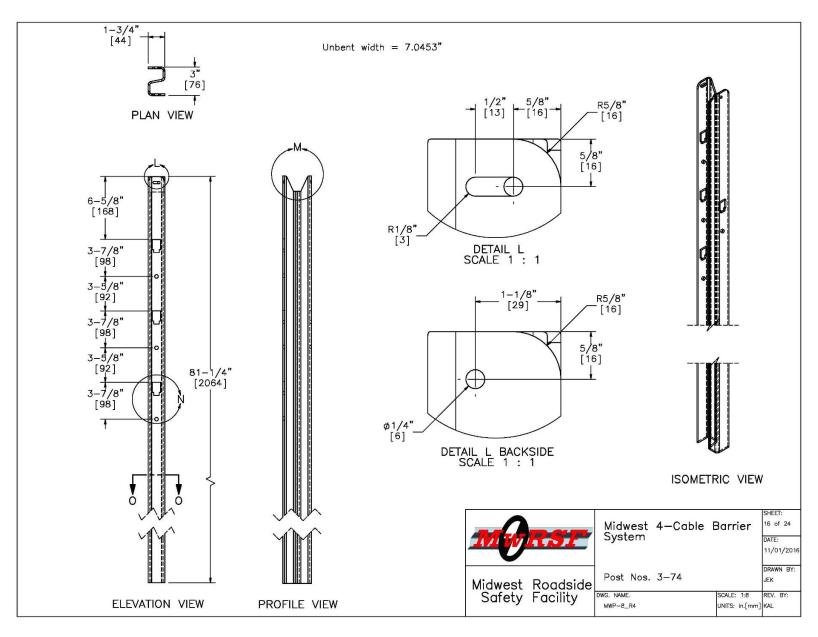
Midwest Weak Post Details, Test No. MWP-8
